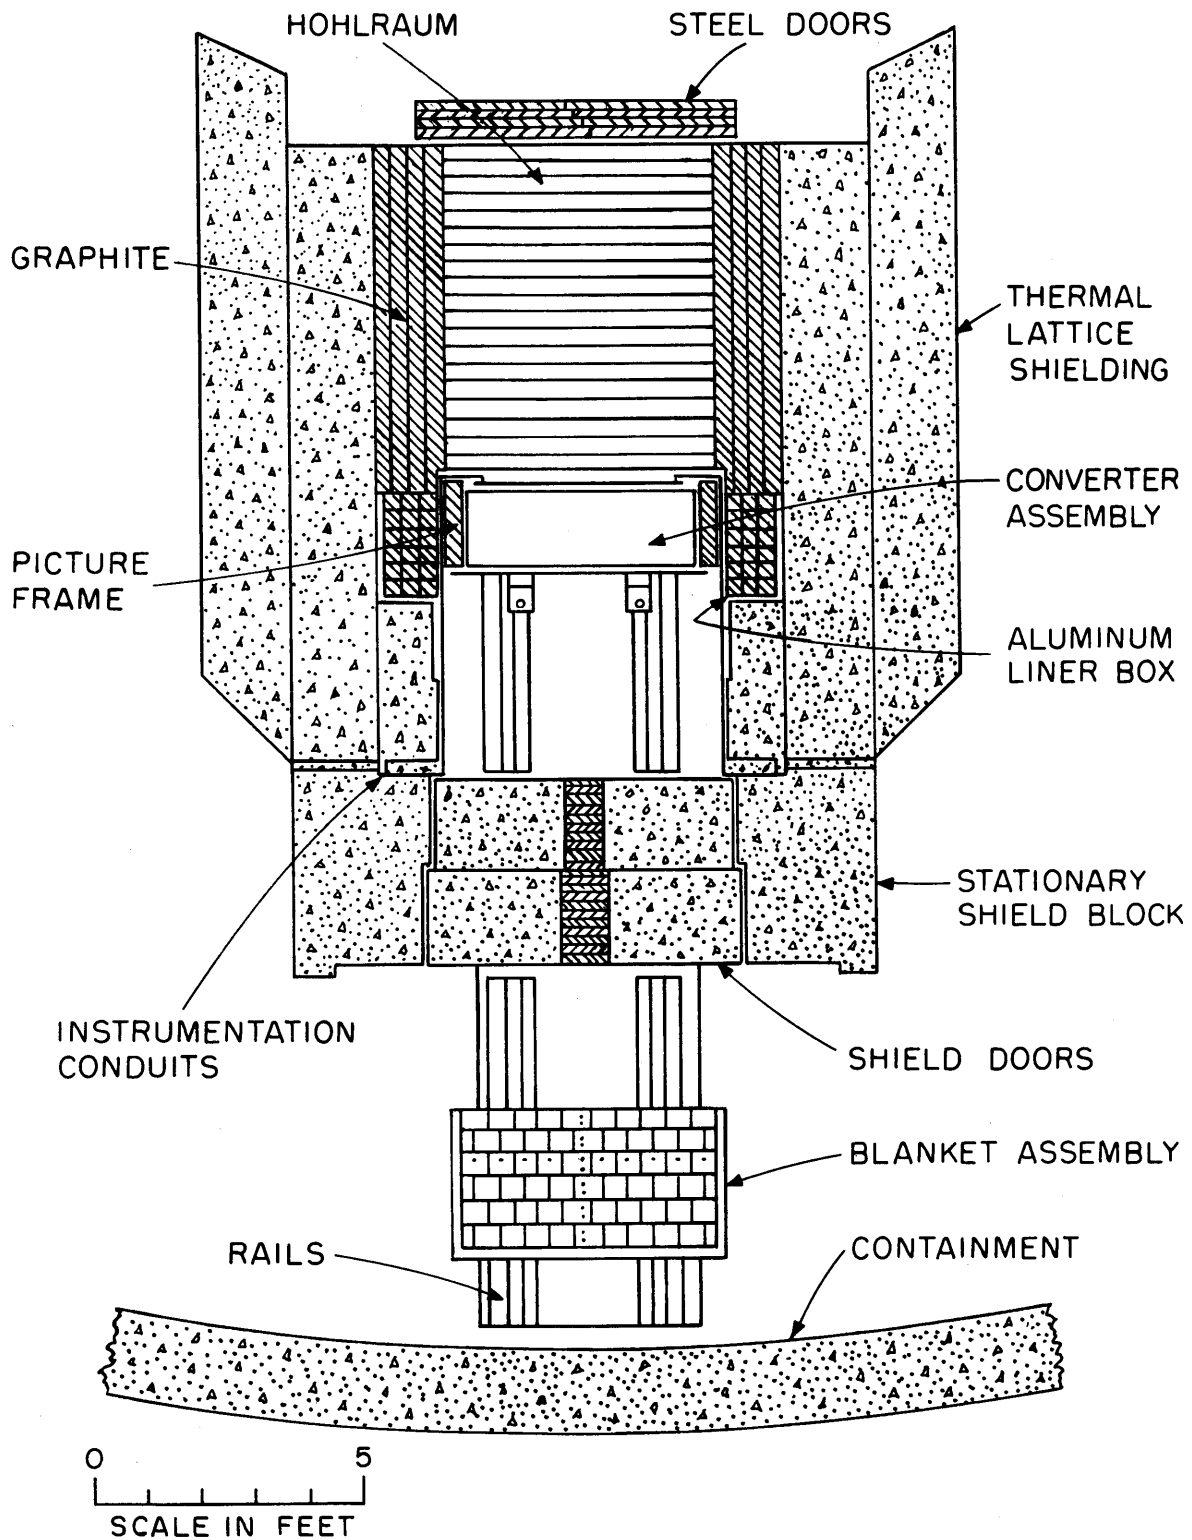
SCHEMATIC PLAN VIEW OF THE HOHLRAUM AND BLANKET TEST FACILITY
